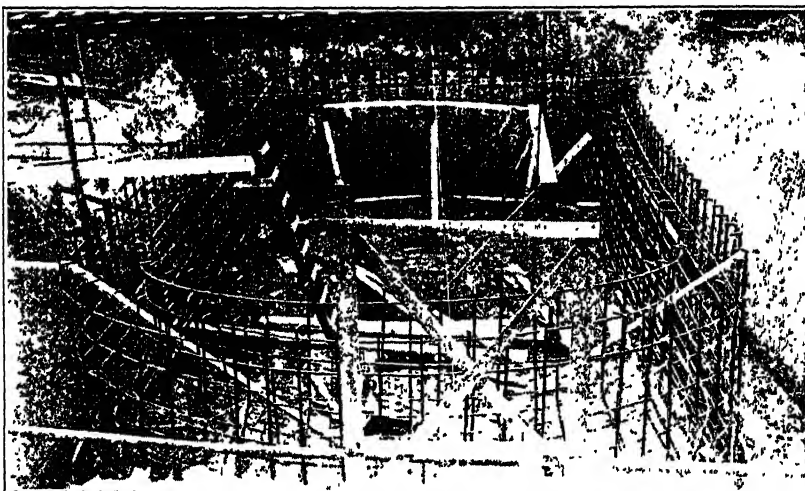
CONSTRUCTION AND REINFORCEMENT OF CAISSON.
